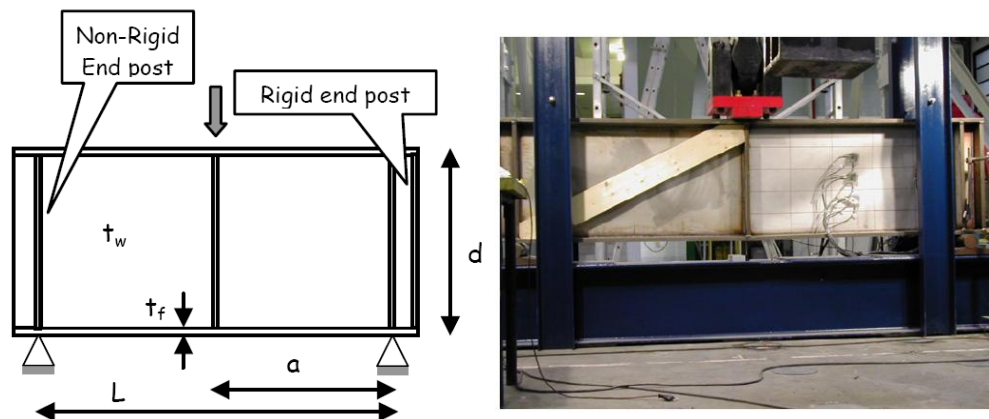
Test specimen geometry and loading scheme of Series II, (Real et al., 2003).
